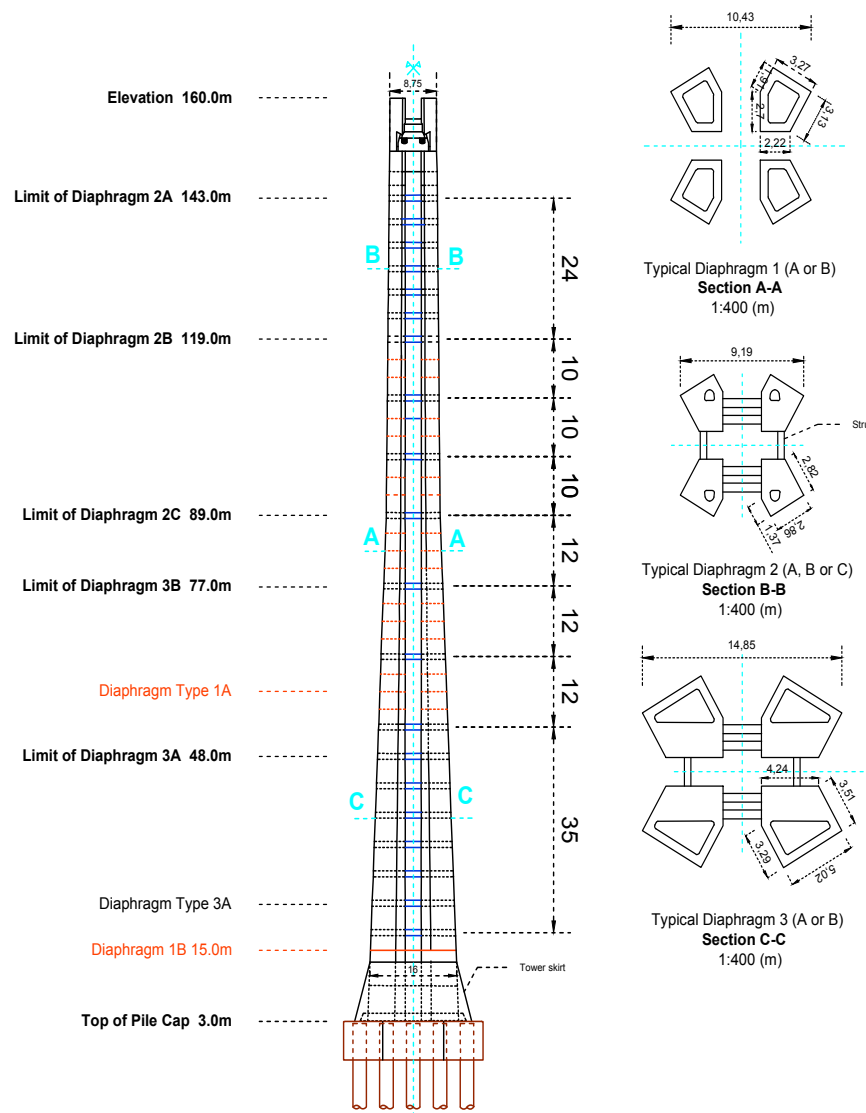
Tower longitudinal elevation and typical diaphragm sections (Ref.: AutoCAD made by the author).
